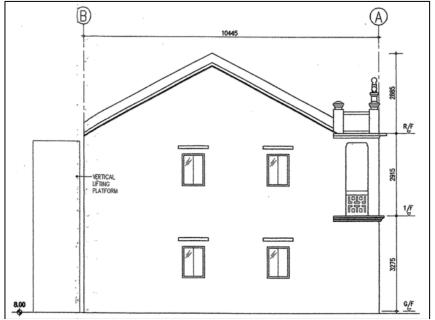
South elevation of the Fong Yuen Study Hall (As-built drawing (2012), extracted from Fong Yuen Study Hall – Resource Kit. 2019).
